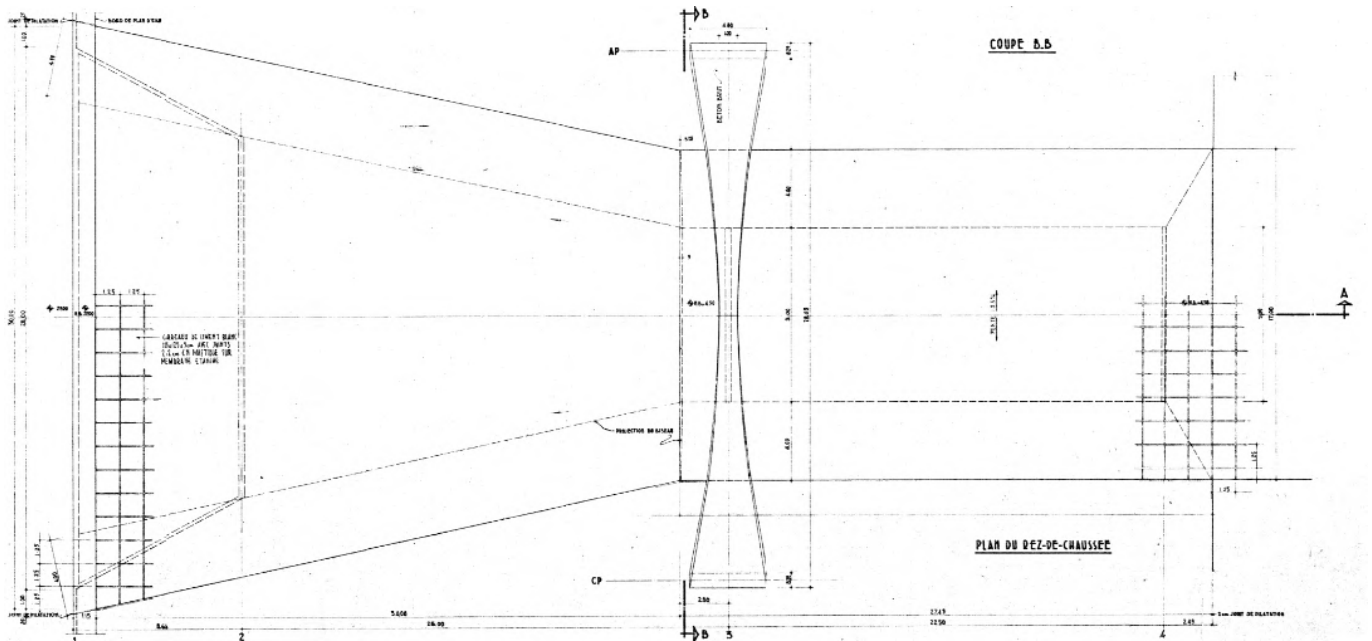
Plan of Arch and bridge at OAT from the original drawings (Darr el Handasah Consulting Engineers, A102, update of 1968)
